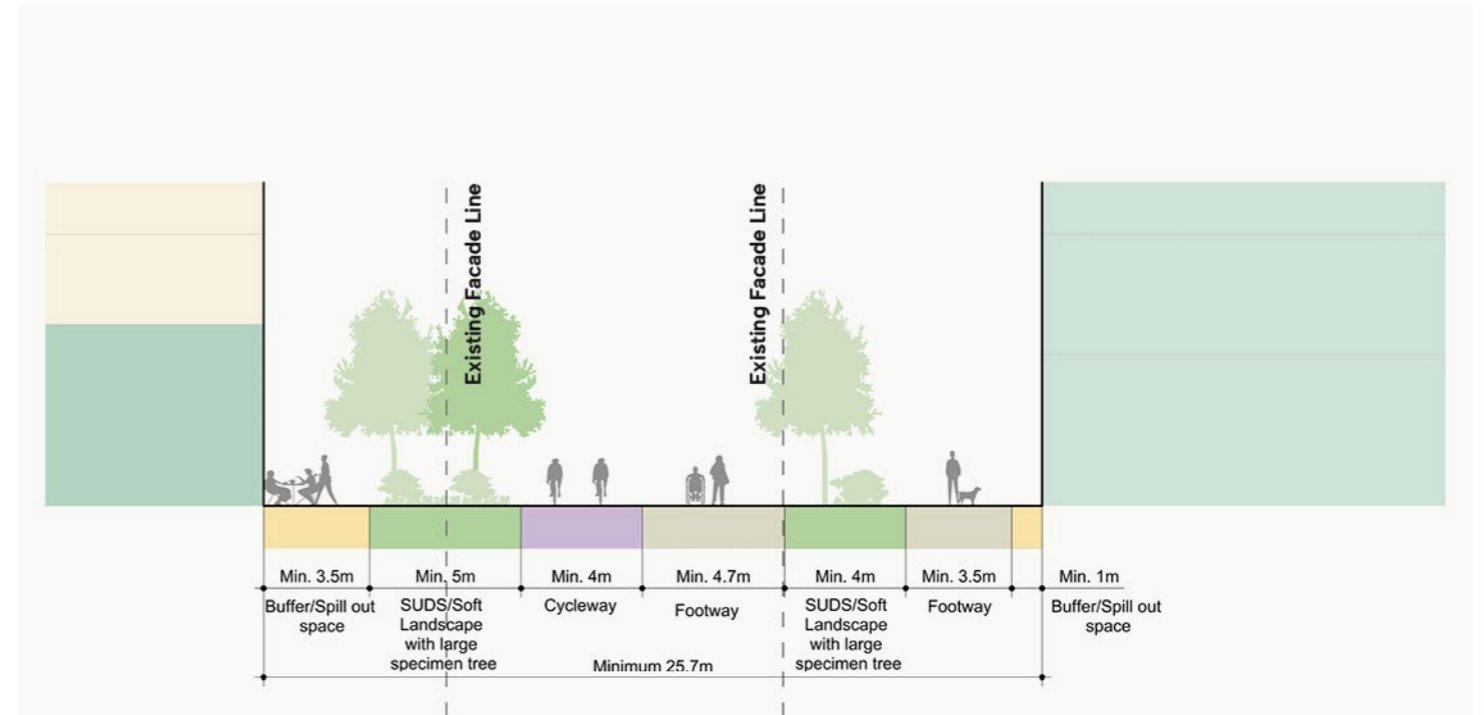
Section A: Cross section of the long-term ambition for Albert Crescent South
